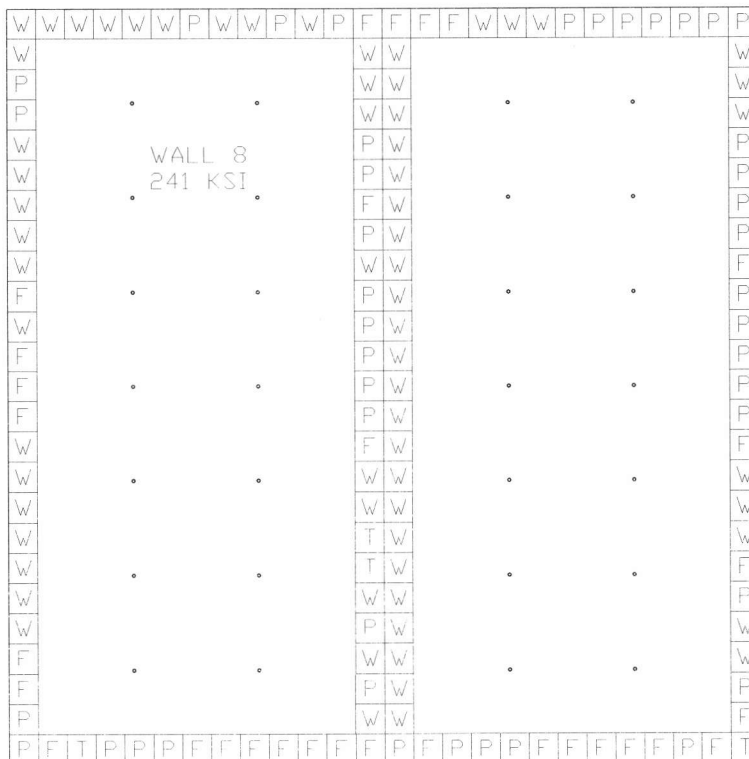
Sheathing nail failure modes for Wall 8, $f_{yb}=241$ ksi.
